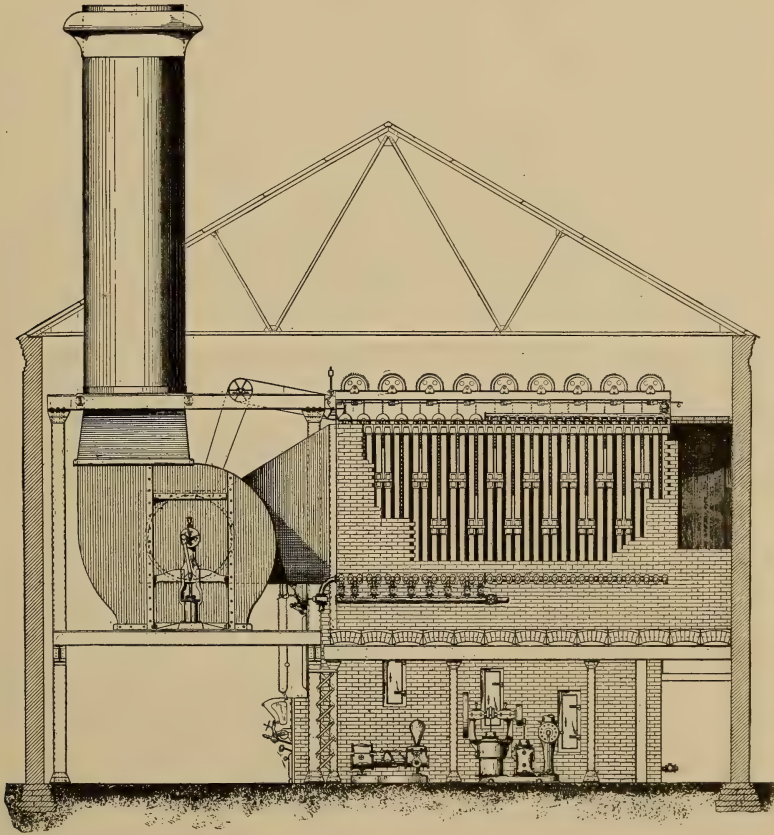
CROSS SECTION OF A TYPICAL BOILER-HOUSE, SHOWING BOILERS, STOKERS, ECONOMIZER, MECHANICAL DRAFT, FEED PUMP, AND CONDENSER.
